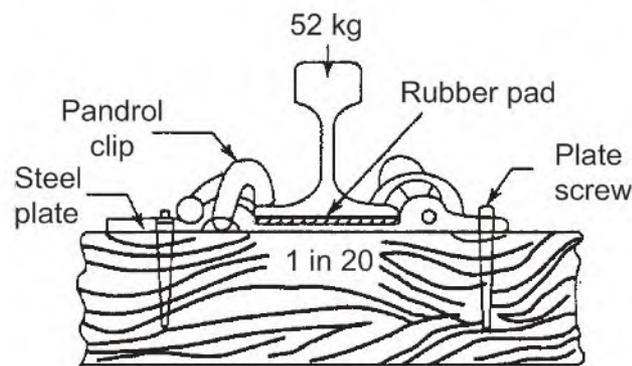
(a) Pandrol clips with wooden sleeper and steel pad
